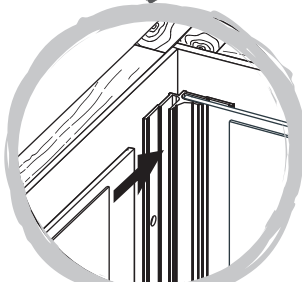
Install the shower wall panel to the wall as shown in the illustration.
